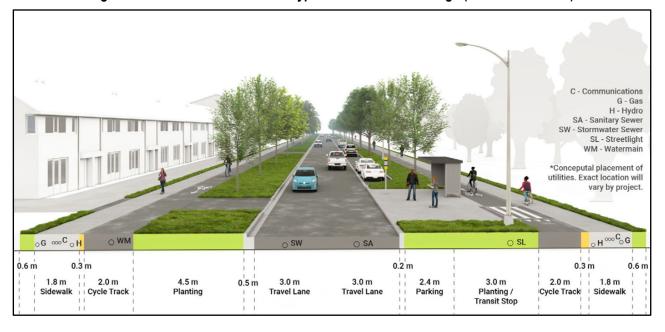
20 m ROW Main Street Typical Cross-Section Design
